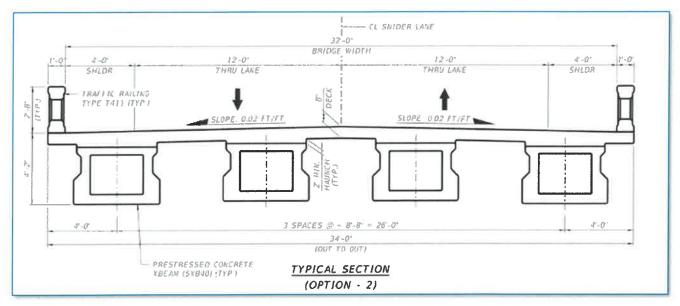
TxDOT Prestressed Concrete XBeams (5XB40) Typical Section
